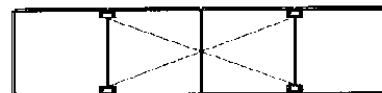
Arrangement of lifting angles (plan view of mns-sections)
